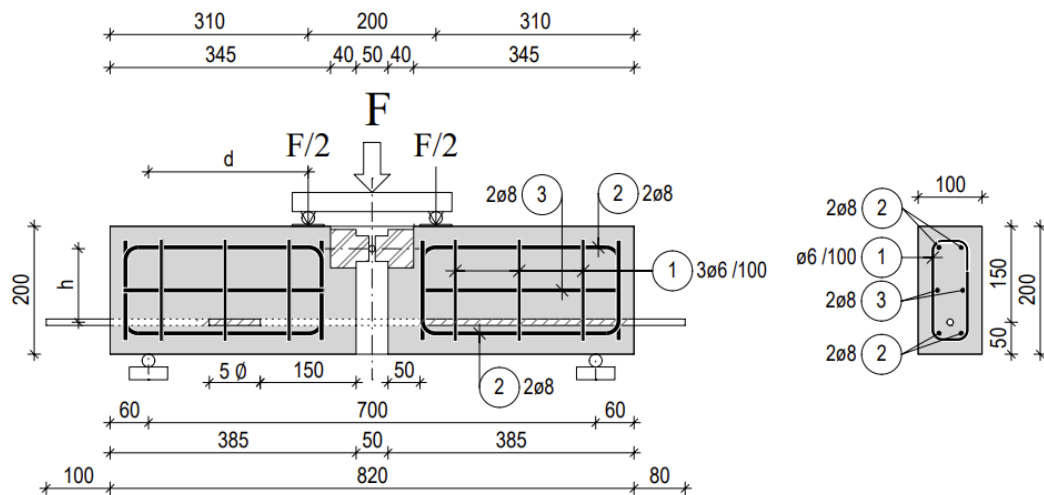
Geometry of the beam specimen (dimensions in mm)
